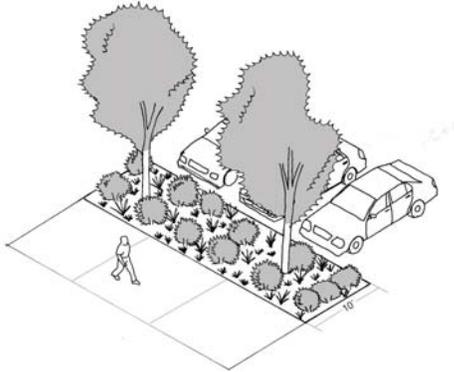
10-foot parking lot buffer with Type C landscaping.
